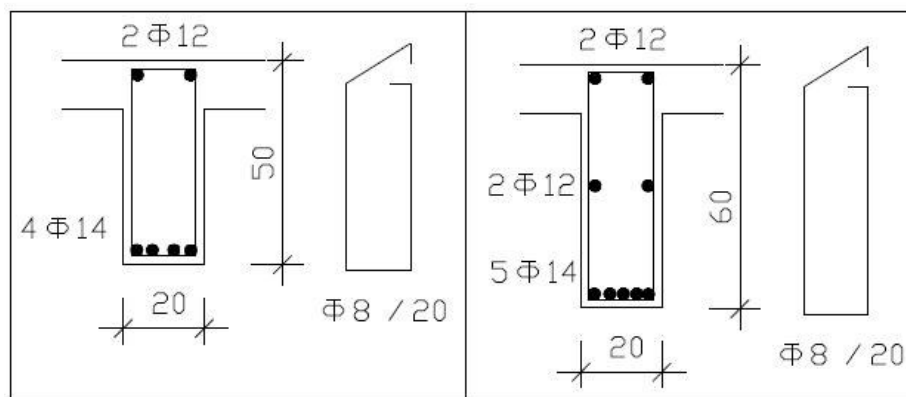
Typical beam sections (beam dimensions and stirrup spacing in cm; reinforcement in mm).
